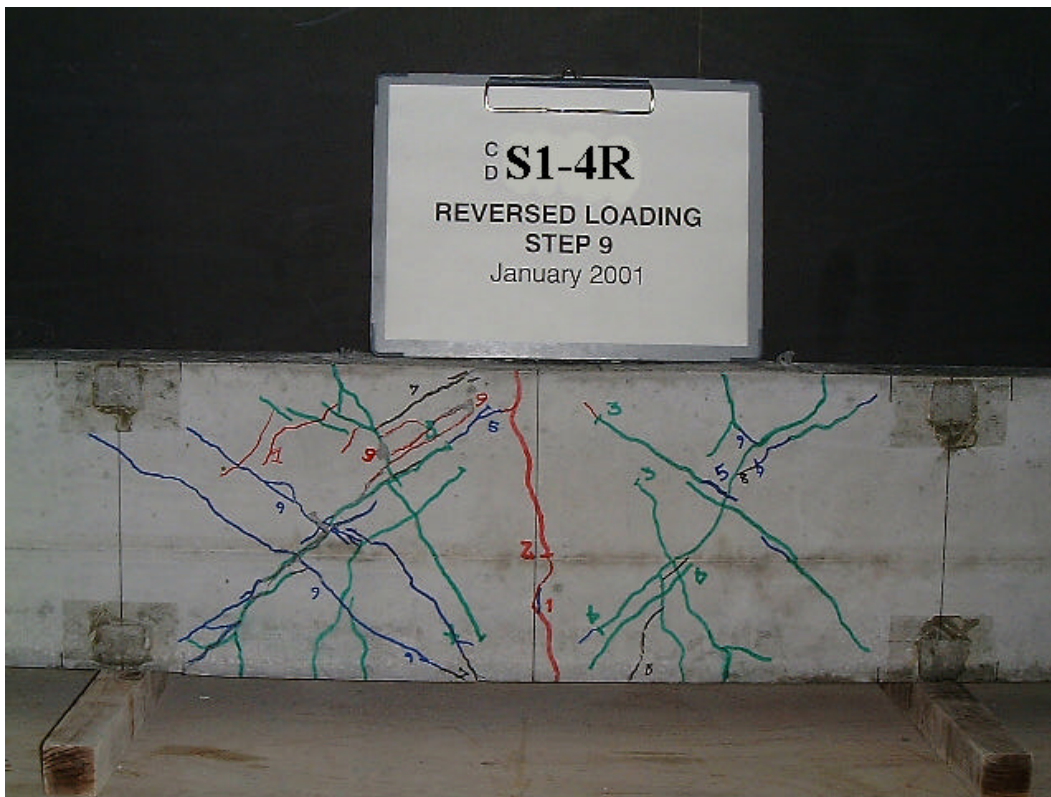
Crack Pattern of specimen S1-4R under reversed loading
